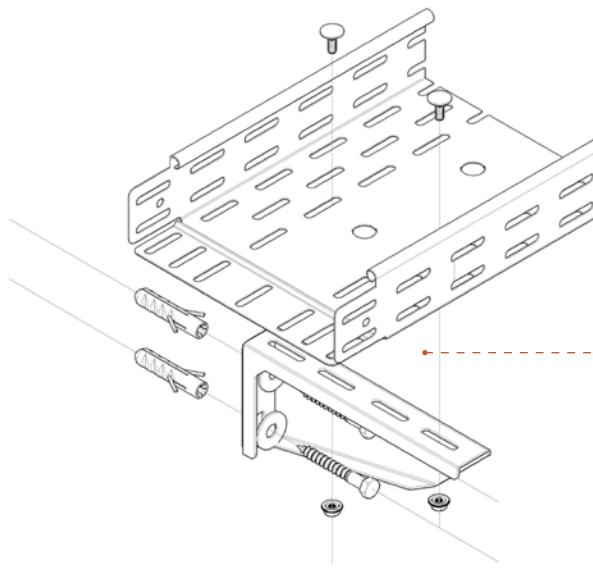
Example of the installation of the cable tray onto the wall with the curved SNT wall bracket or welded SNV bracket
